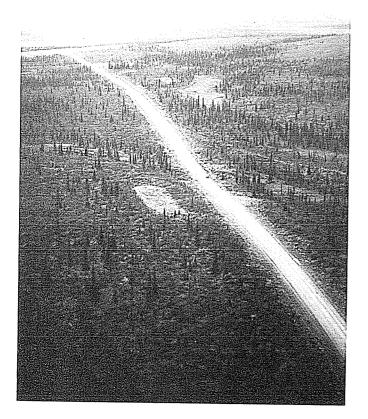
D.2 BORROW AREAS NEAR THE DENALI HIGHWAY SHOW LACK OF NATURAL VEGETATION
